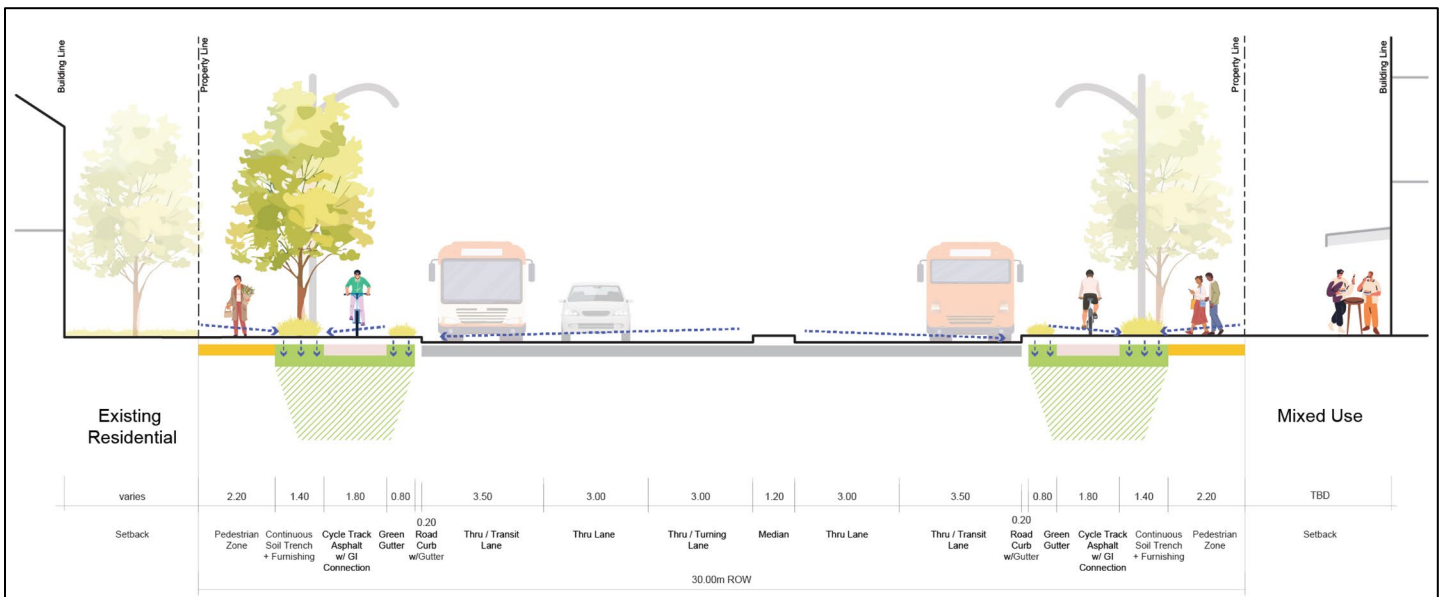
Existing Dufferin Street (Highway 401 to Wilson Avenue) Cross-Section - Option 2
